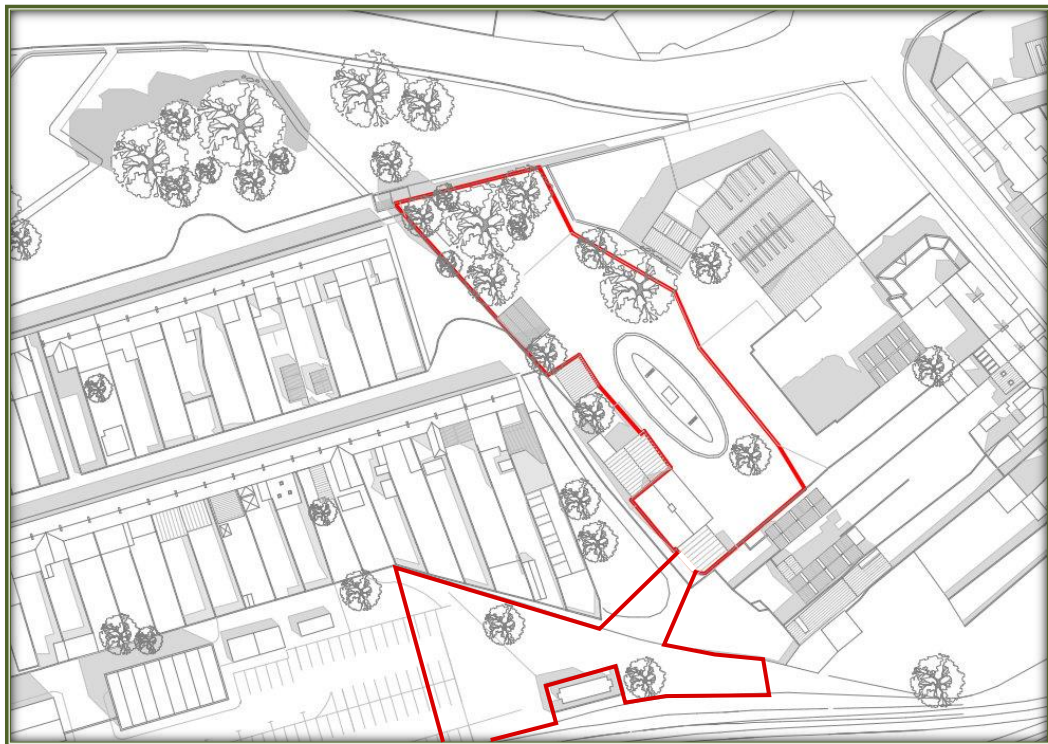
Extract from the Existing Site Plan (OC+C Architects)
